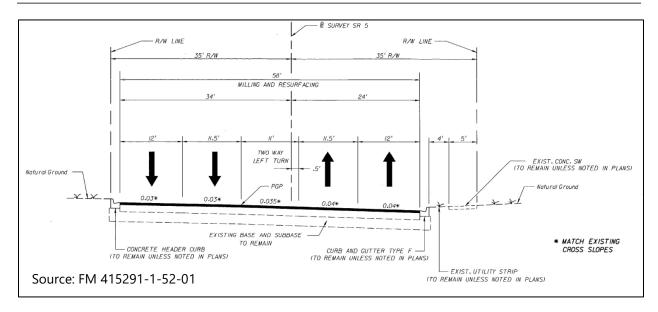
Existing Typical Section 2 – SR 5/US 1
